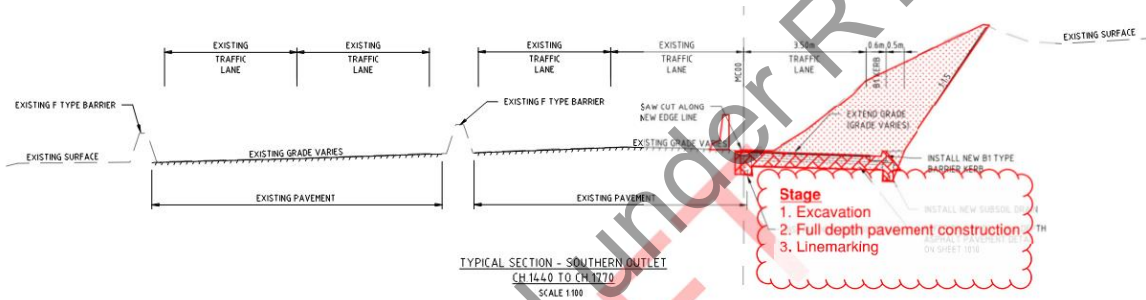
Typical section – Southern Outlet Ch. 1440 to Ch. 1770
